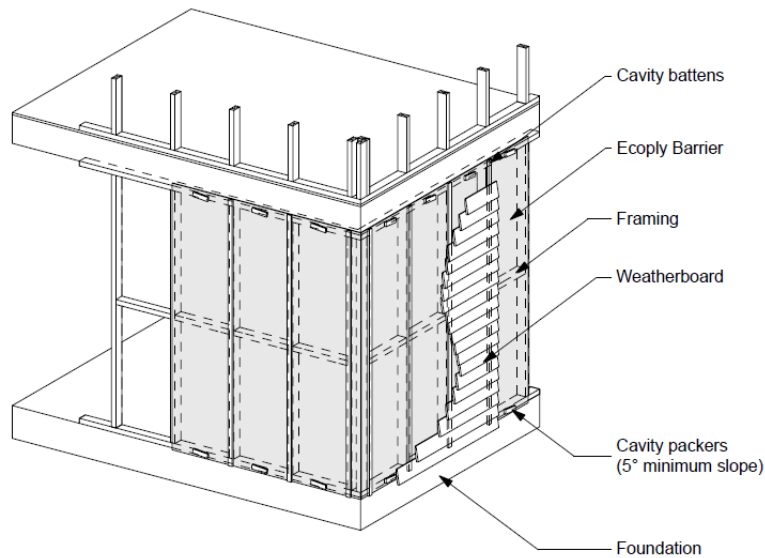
Construction details of the Plywood Rigid Air barrier in the Test House. (Carter Holt Harvey 2014)
